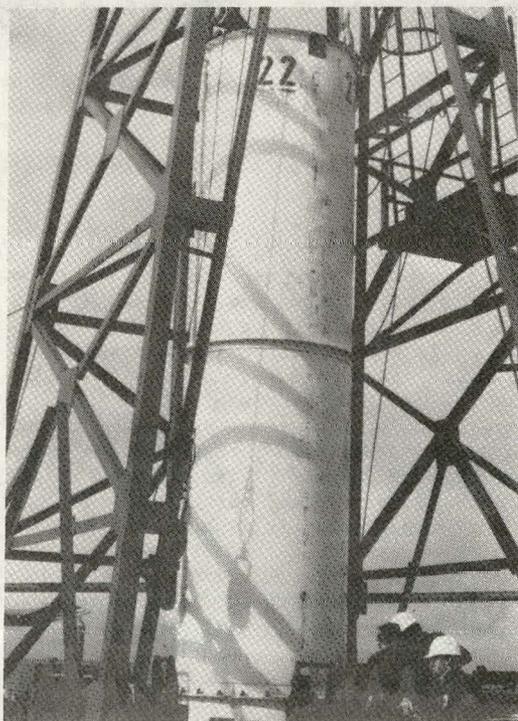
Pipe Section Being Assembled During At-Sea Tests
